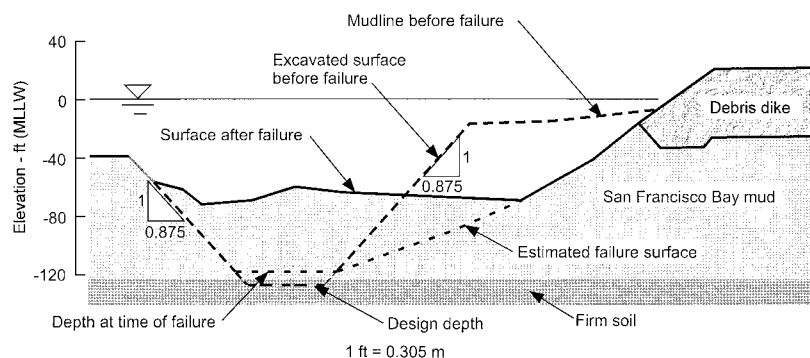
Cross Section through Excavated Trench at LASH Terminal after Failure
